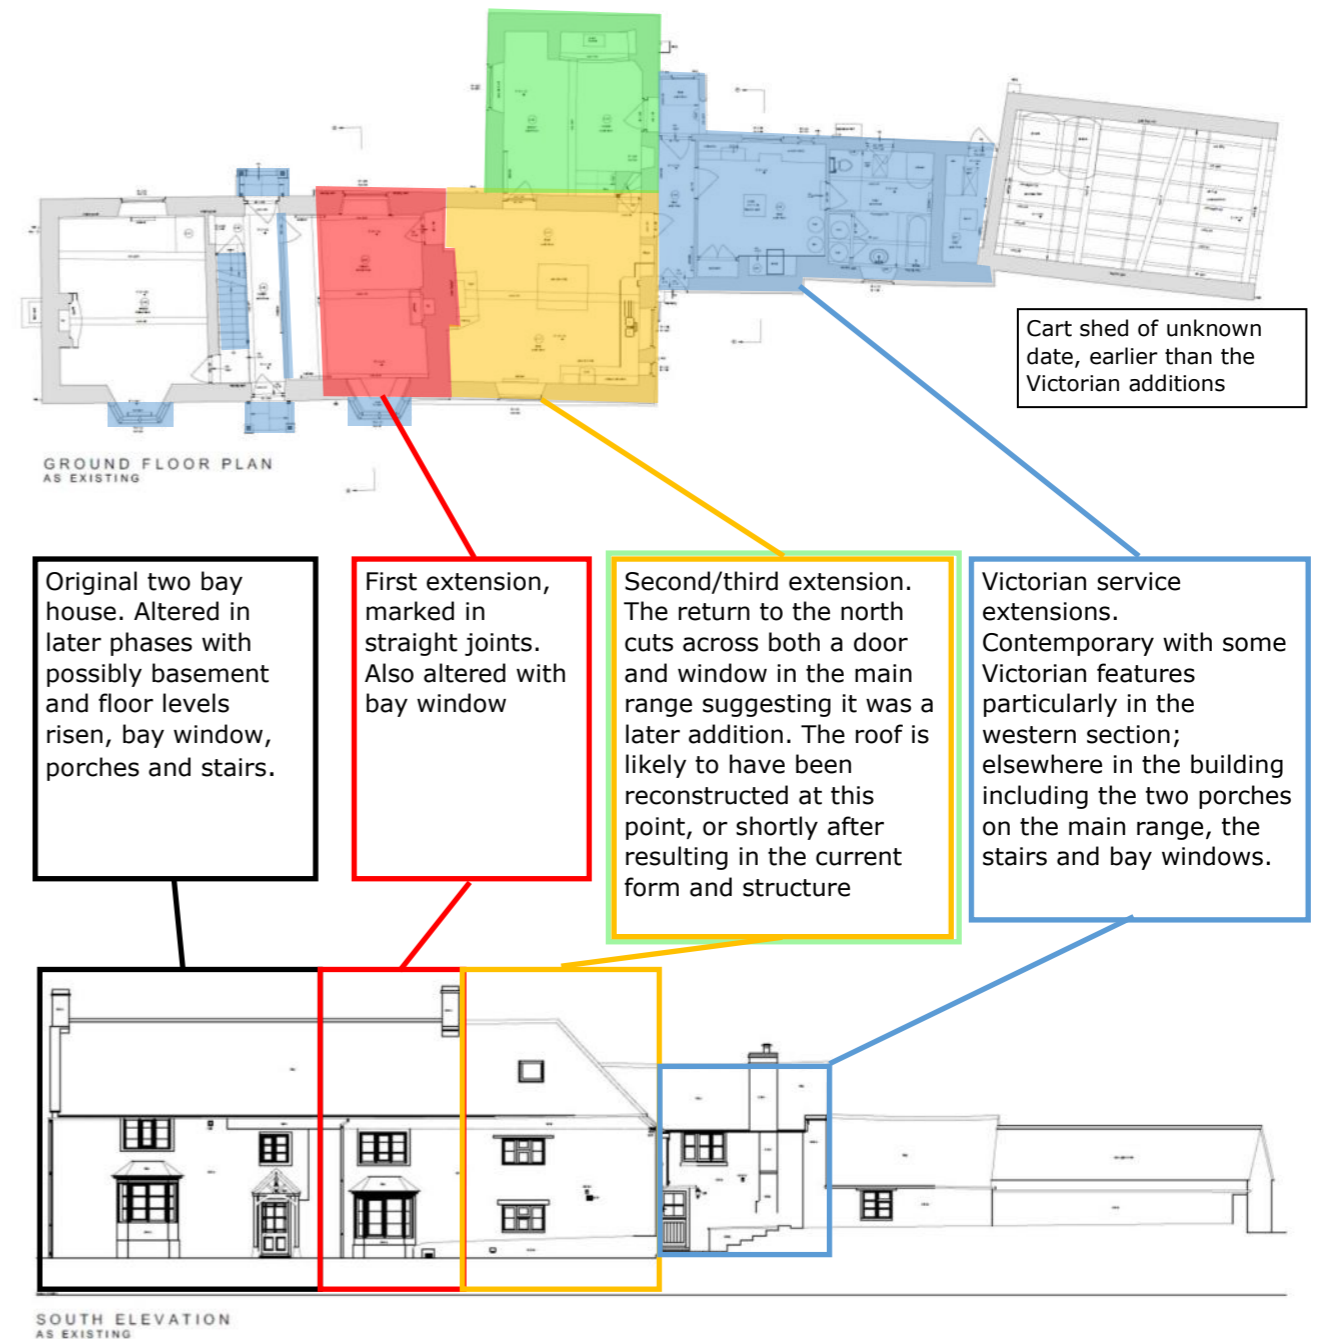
Ground floor plan and garden elevation showing primary phases of expansion and growth.
